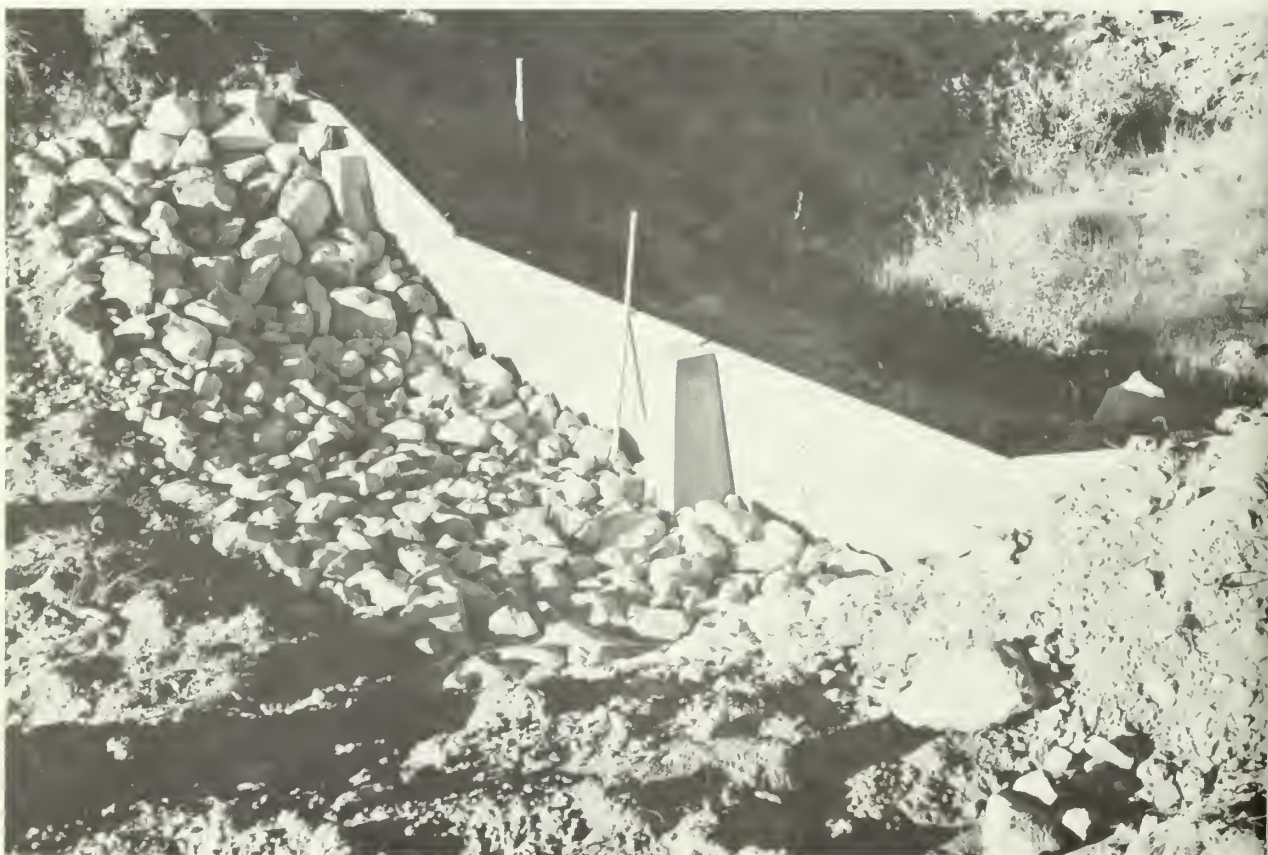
Downstream face of completed prefabricated concrete check dam (Heede 1965).
